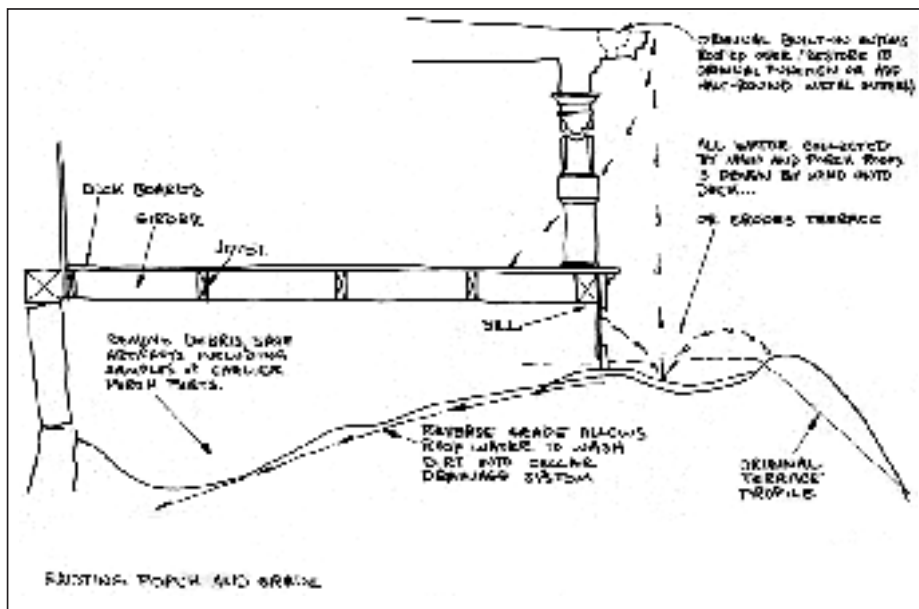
Unchecked water flowed into the basement, causing the foundation stones to shift. Excess moisture also caused the above deck boards to buckle and rot.
